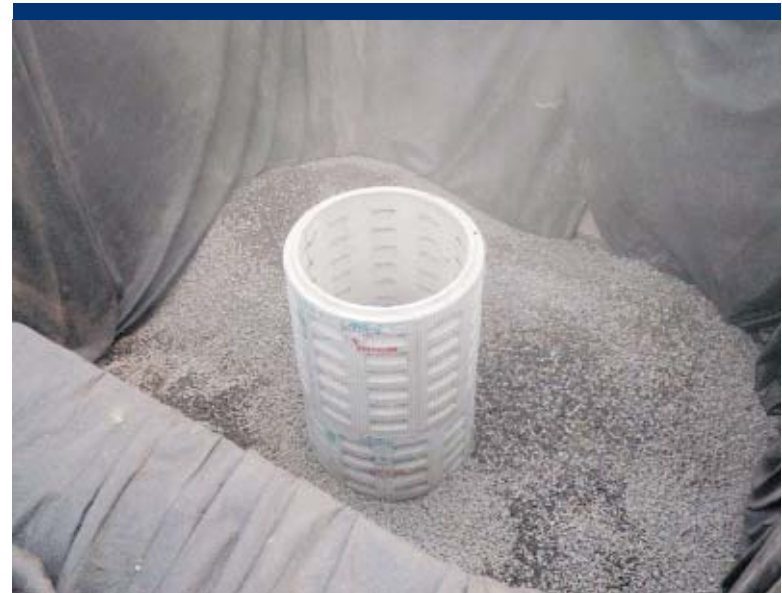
Lower portion of dry well with slots for drainage, surrounded by drainage rock fill.
